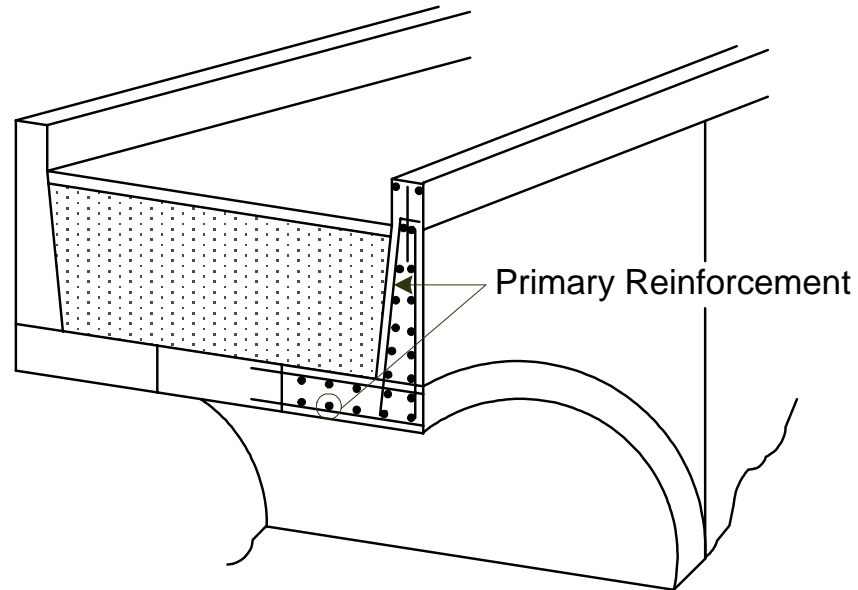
Reinforcement in a Closed Spandrel Arch
